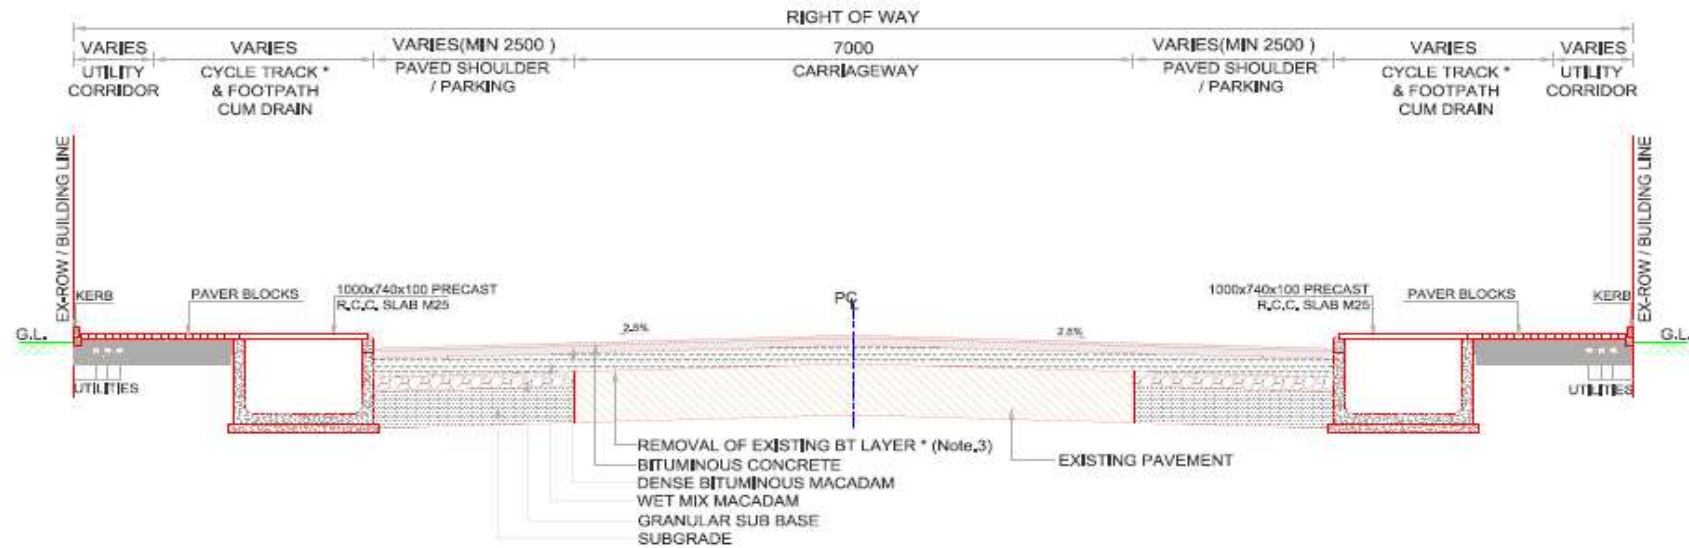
TCS-4 Two lane carriageway with paved shoulder in Urban / Village area
